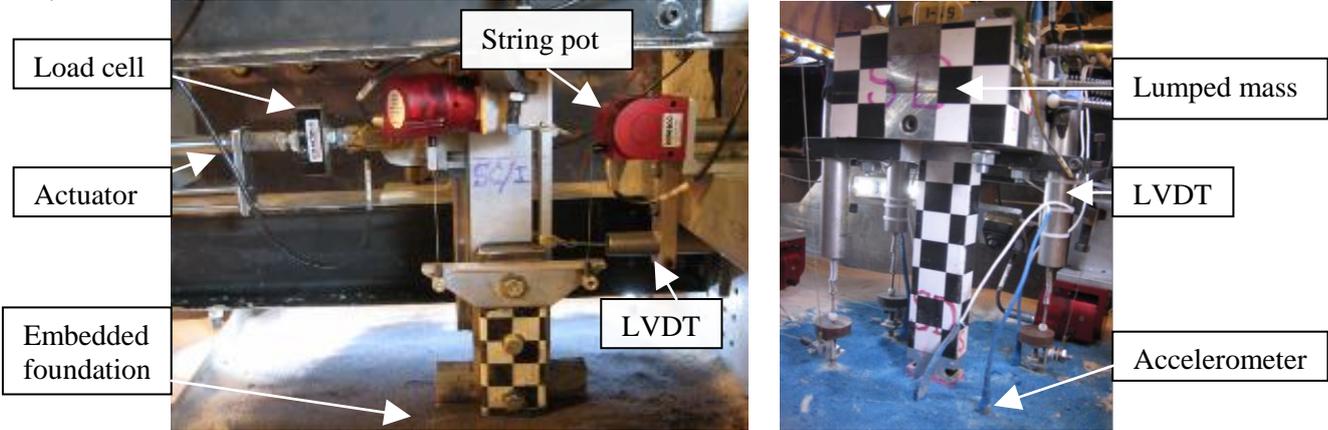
a) A typical structure-foundation setup for a slow cyclic test. b) A typical structure-foundation setup for a dynamic test.
